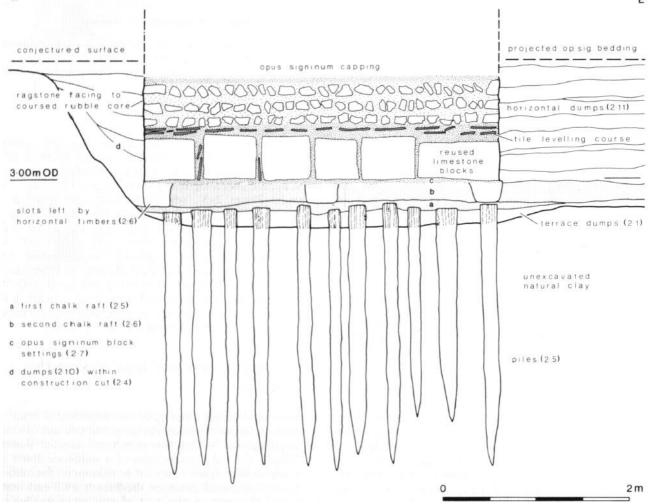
Reconstructed section through the masonry foundation on the Peter's Hill excavation. Eight stages can be identified in the construction of the foundation. Preparatory dumps and terracing (1) levelled the area for the pile preparation (2) (size conjecturedfrom Sunlight Wharf evidence, p57), which supported the first chalk raft (3). A second chalk raft (4) was horizontally braced with a timber framework (5), above which a single course of massive limestone blocks was placed (6). This, in turn, supported a coursed rubble core, with tile coursing (7), retained by a coursed ragstone facing (8). (1:40)
